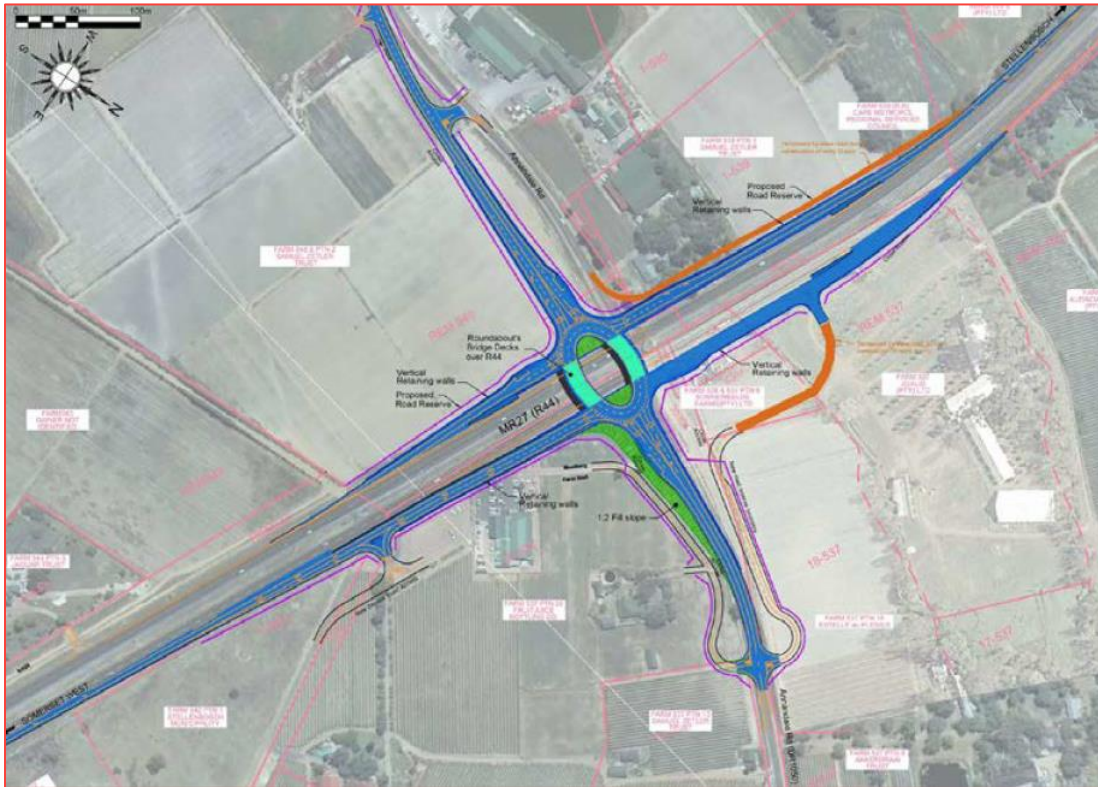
R44/Annandale Road grade-separated roundabout with vertical retaining walls
